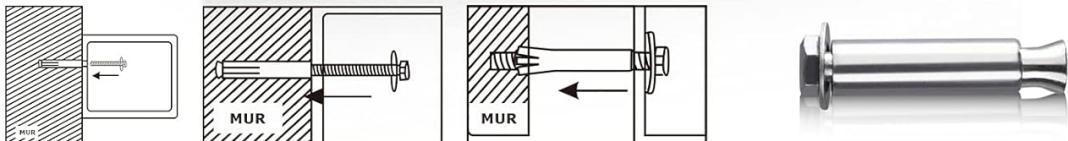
Rear view of the safe, indicating pre-drilled holes for easy wall mounting and illustrating the installation process with screws.
